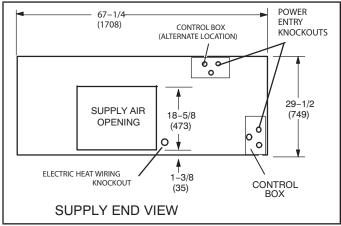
TAA 120 and 150 Knockout Location – Dimensions – inches (mm)
